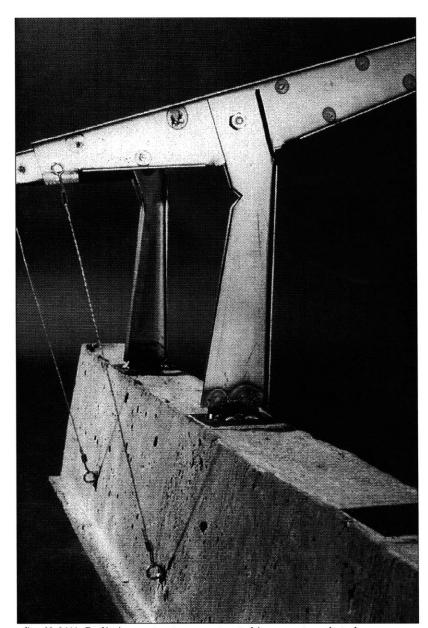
Preliminary structure constructed in concrete and steel.
